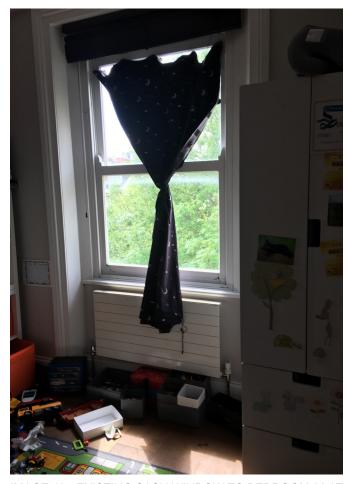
EXISTING SASH WINDOW TO BEDROOM 02 AT REAR OF PROPERTY
